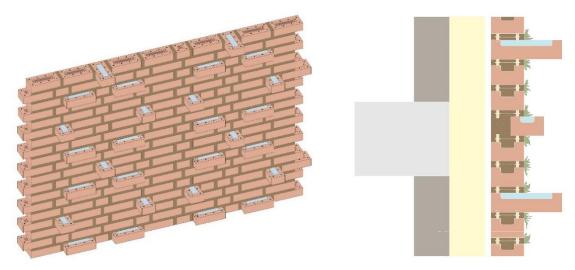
Axonometric view of pattern b, section detail of the wall (own work)
